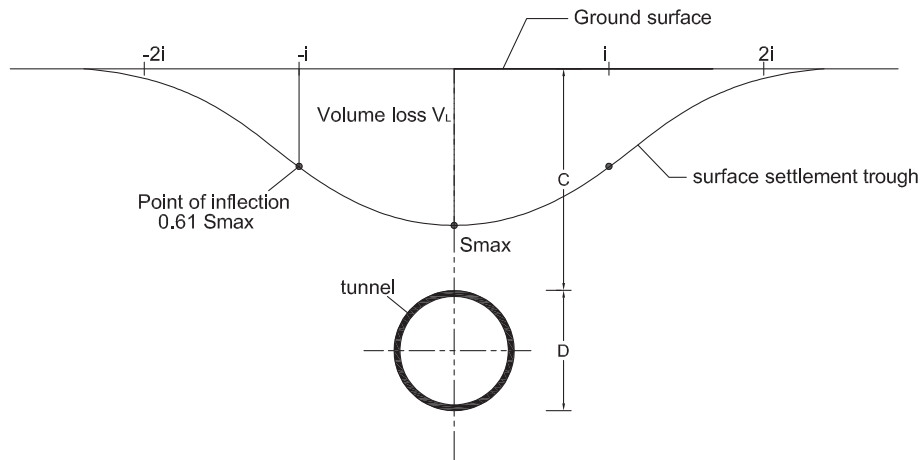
Transverse settlement trough due to tunnelling (Peck, 1969).
